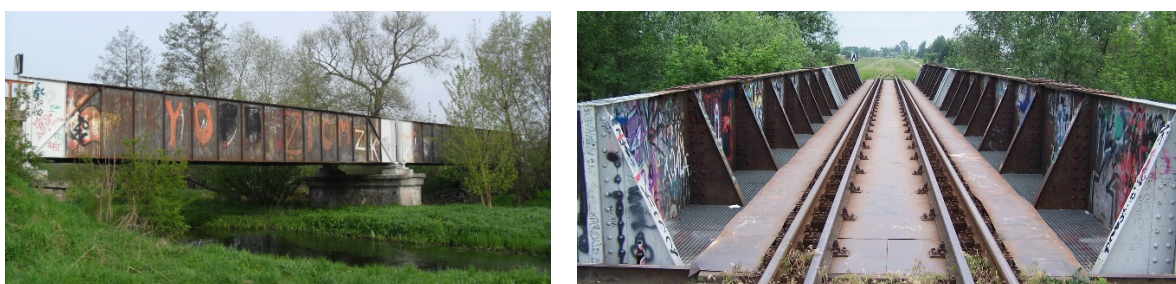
Actual views of the two-span bridge over the Płonka river in Płońsk before retrofitting (2019)
